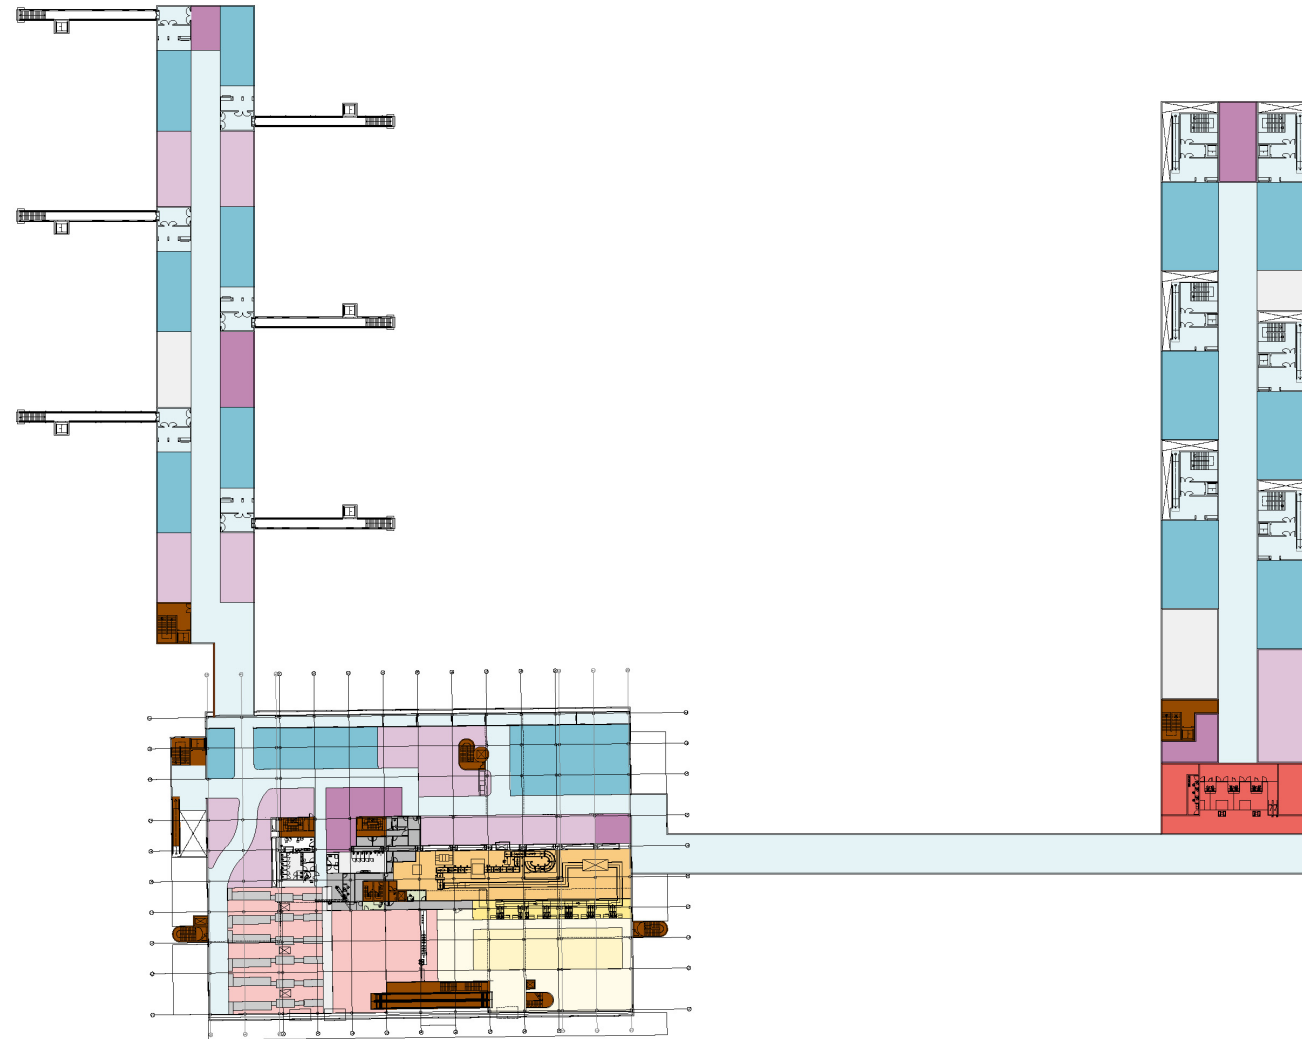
PROPOSED FUNCTIONAL LAYOUT LEVEL 2 (FIRST FLOOR)
